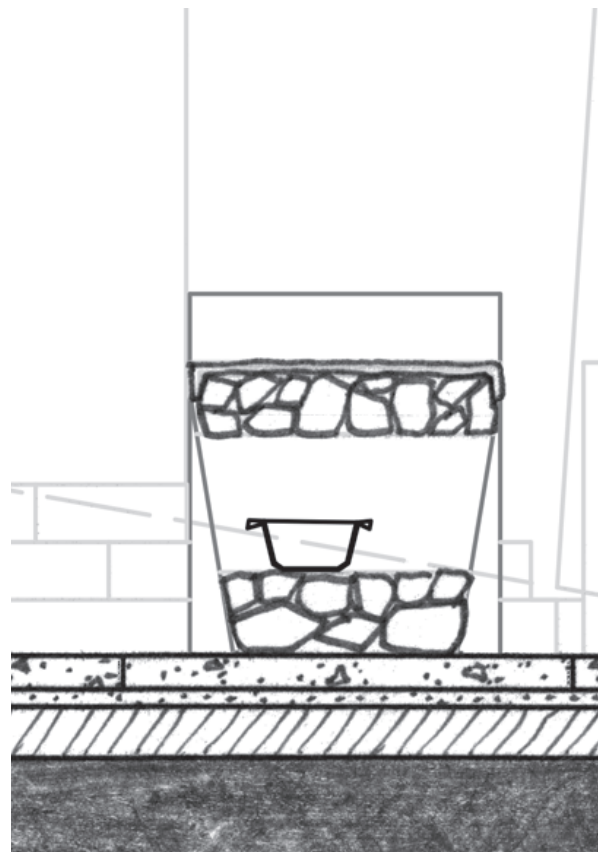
Section through storage cavity of work bench with foot space chamfer (not to scale) (Author 2015)
